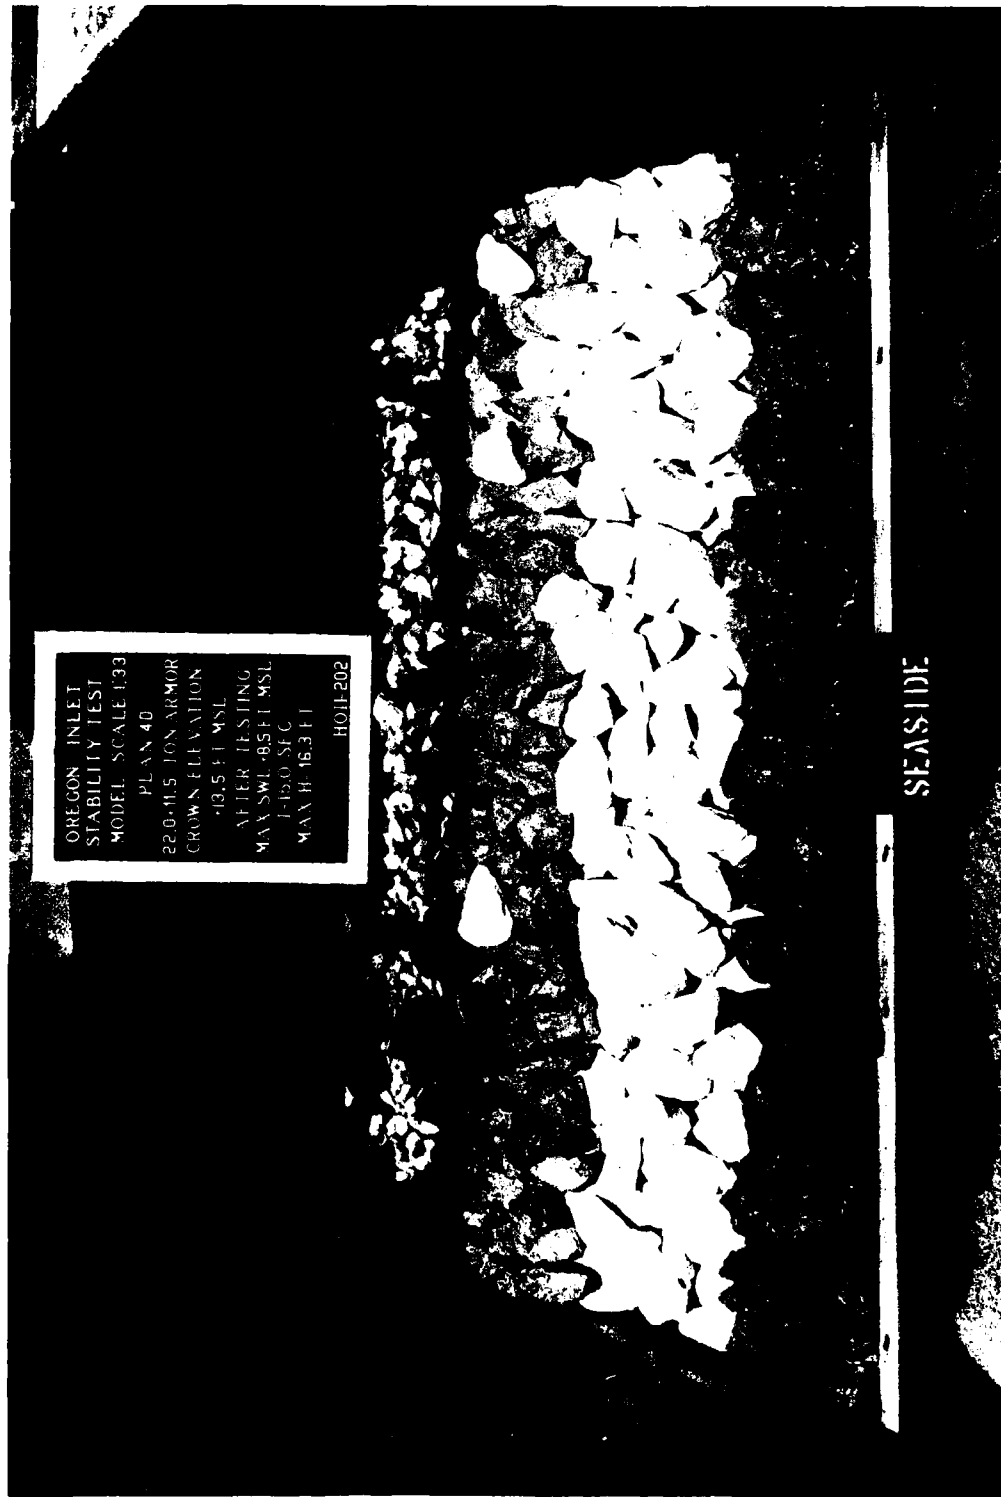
Sea-side view of Plan 4D after testing step 3 of the +8.5 ft NGVD hydrograph
